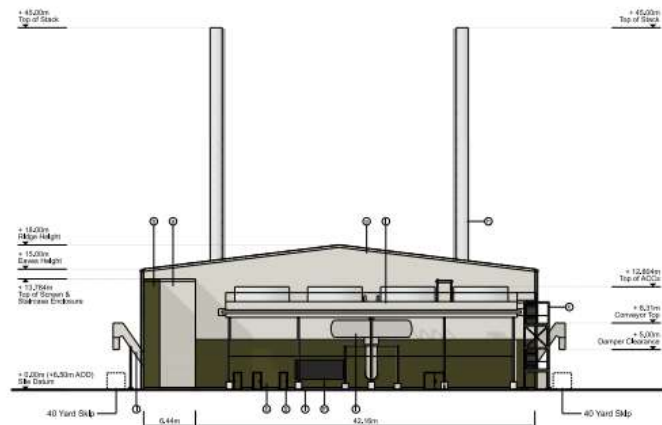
Elevation Drawings of Proposed TERC (East & West)
